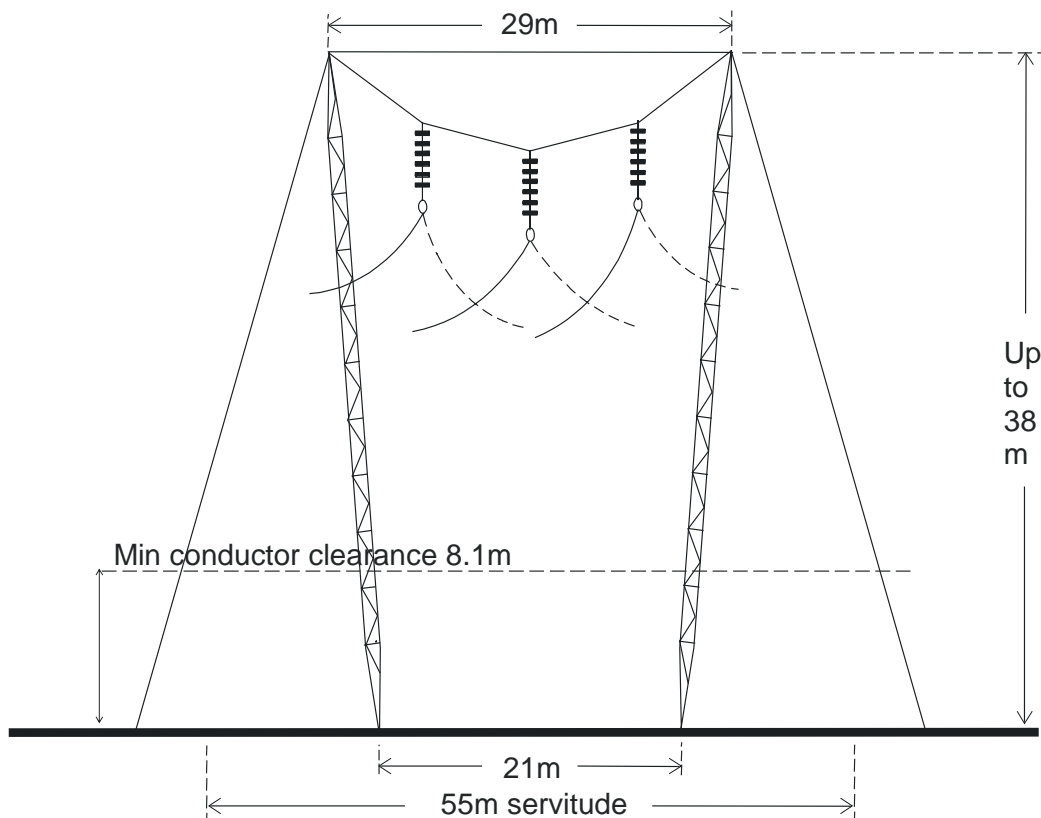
Typical form of a Cross-roped Suspension Tower.
